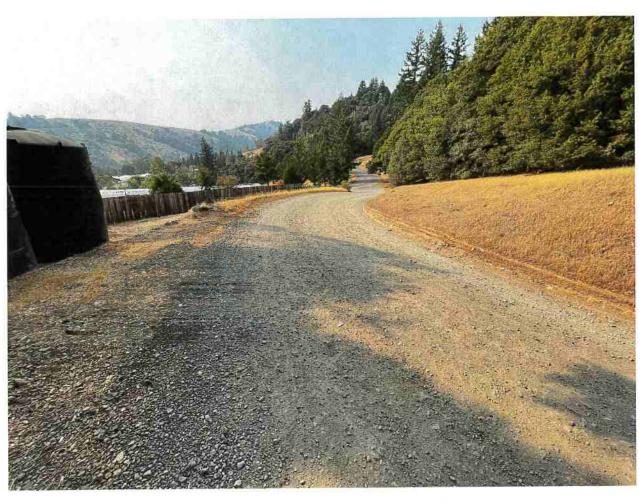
First bend on Old Hindley Ranch Road with ample visibility, facing Mattole Road (Road Width = ± 20 feet).
